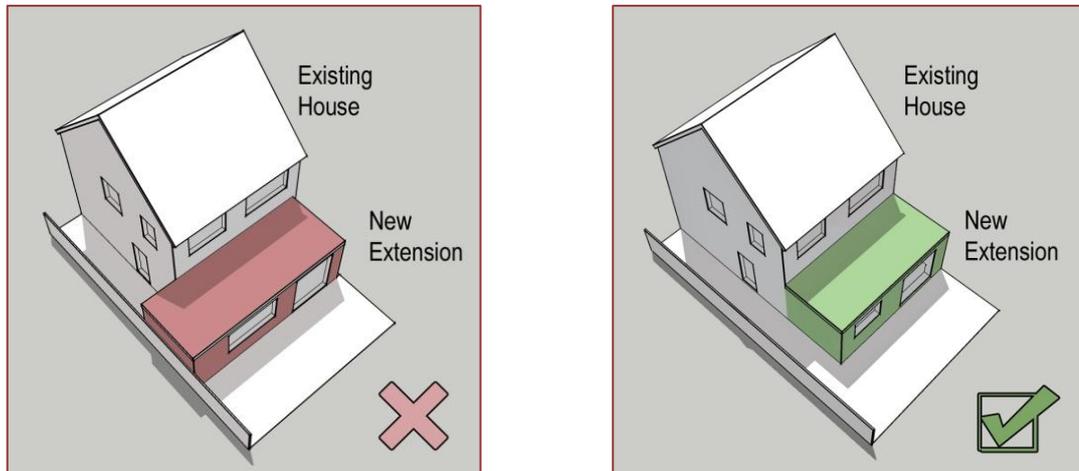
Single storey rear extensions should be subservient and in line with the original building, as illustrated by the drawing on the right
